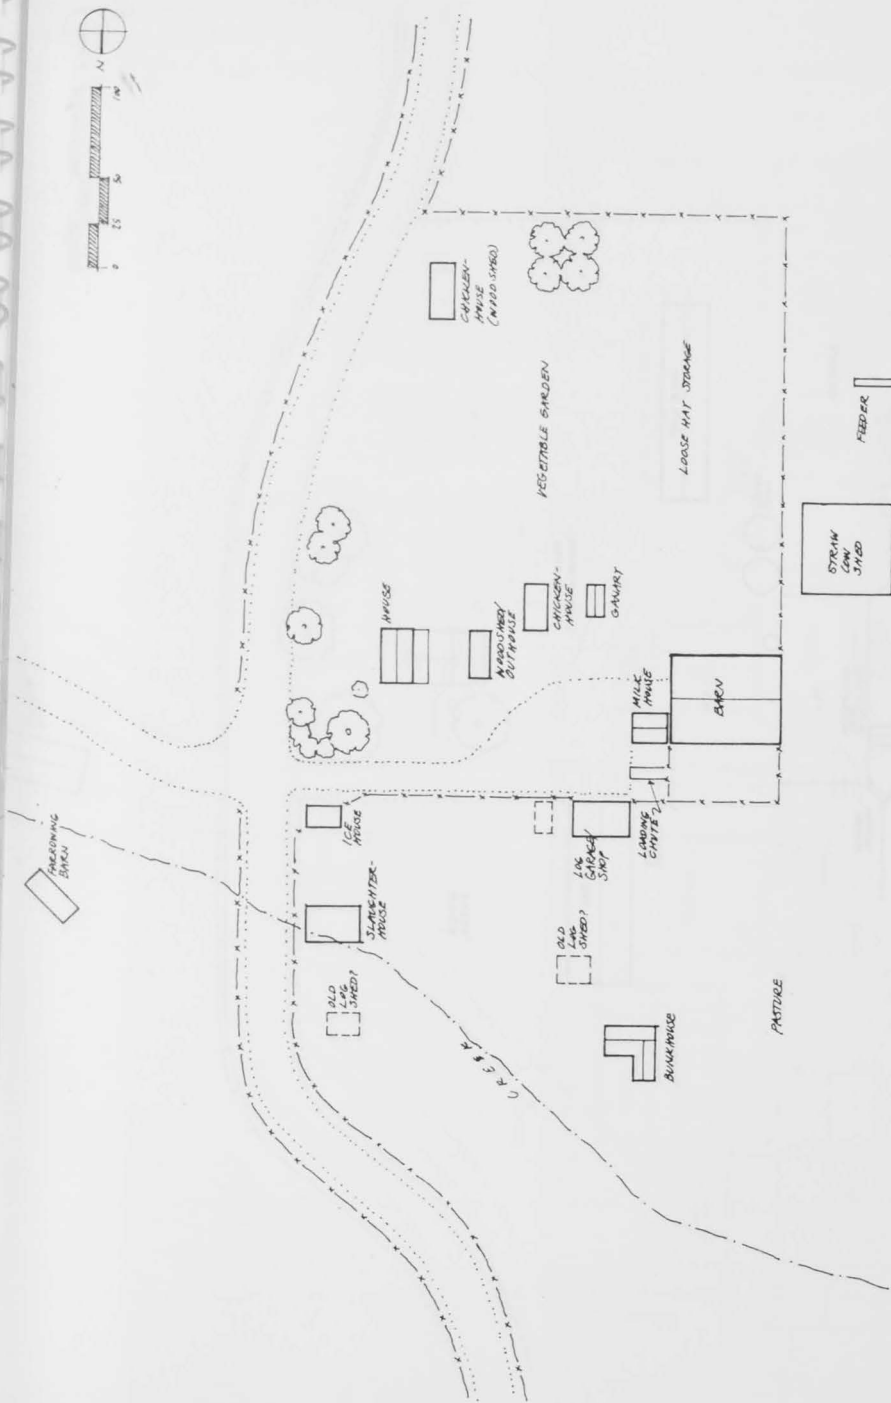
Site #1 - Farm site plan, 1915 - 1930.
